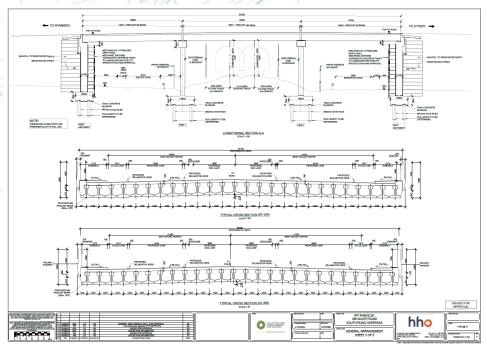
Overpass Bridge Cross Section (Source: HHO, 2025)
